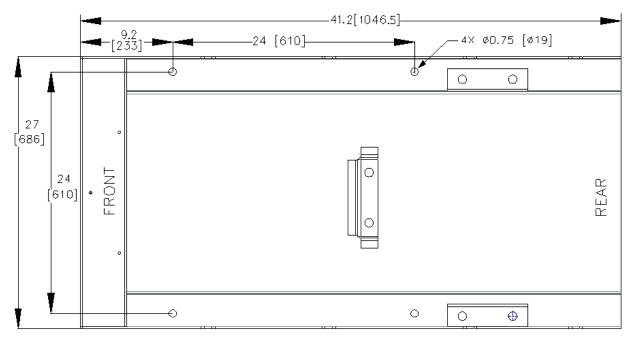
Benchmark 1500/2000 Anchor Bolt Locations
